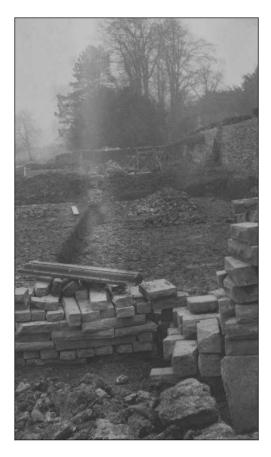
The Dutch garden, under construction, looking south-west (c1926-8)
